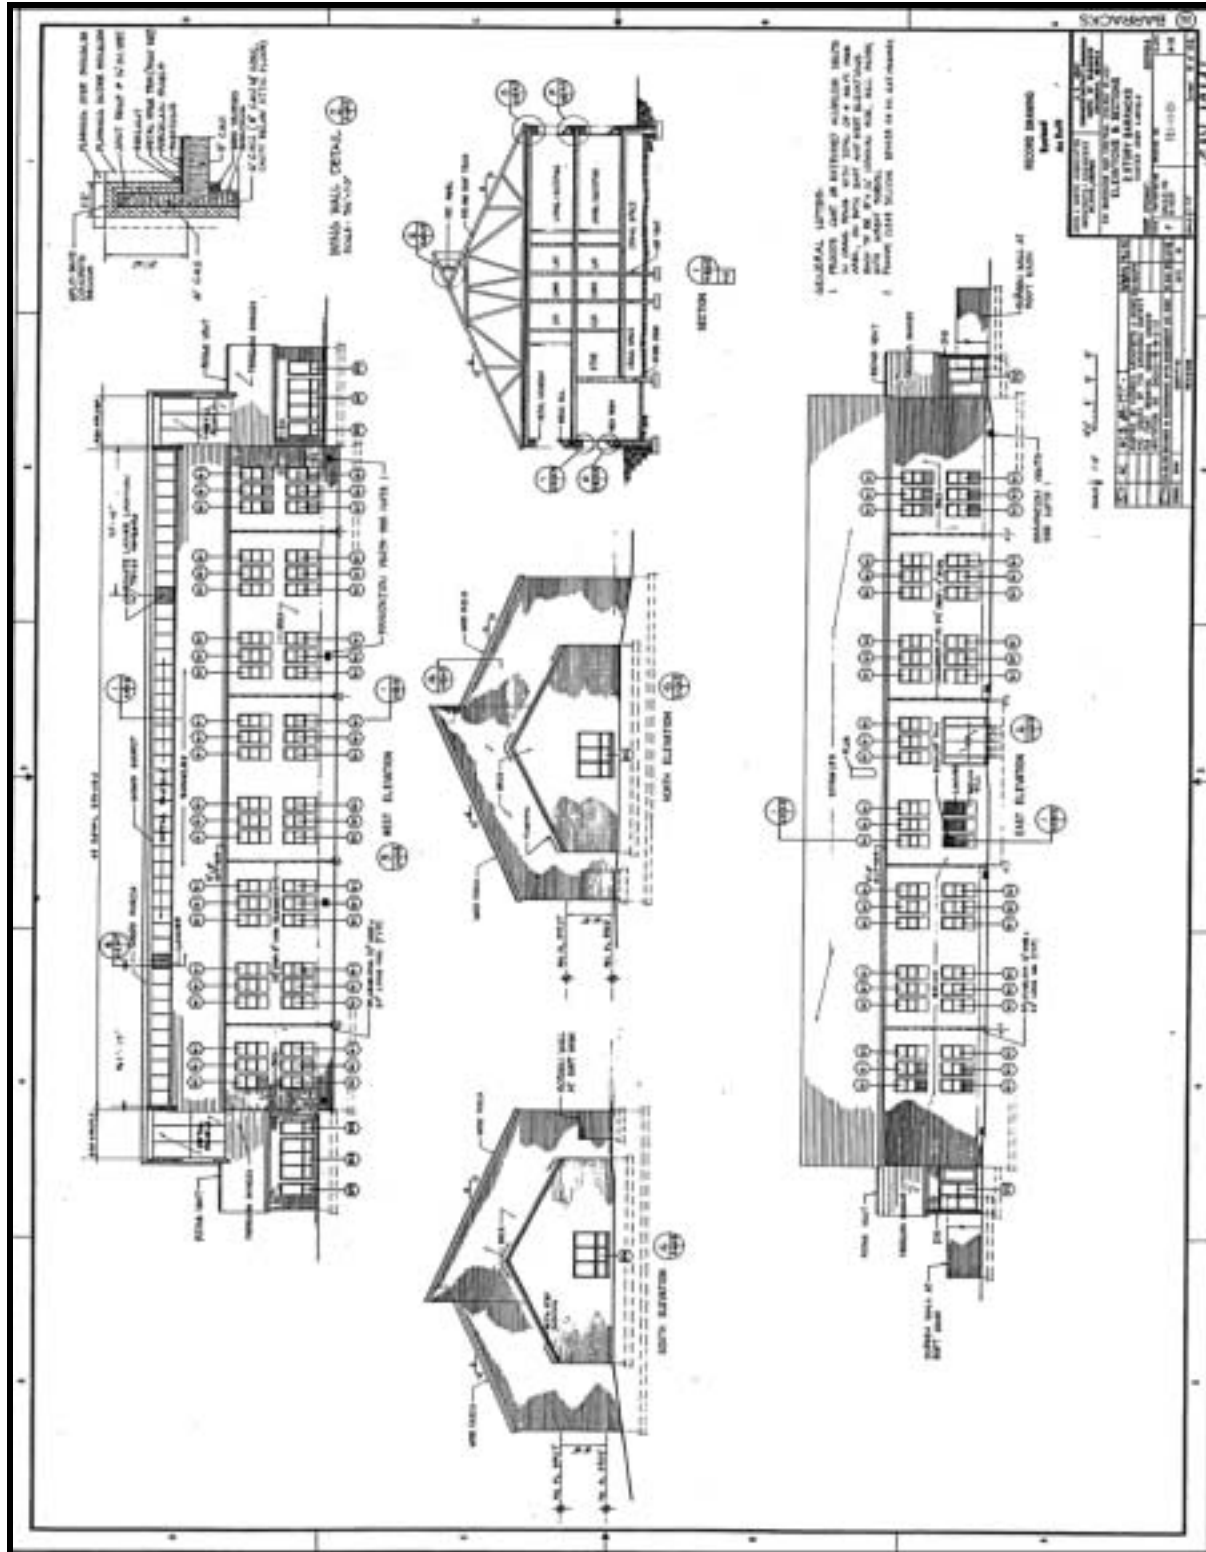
Single Quadrangle barracks, elevations and sections, Ft. Stewart (1983, revised 1985) (Engineering, Ft. Benning).
